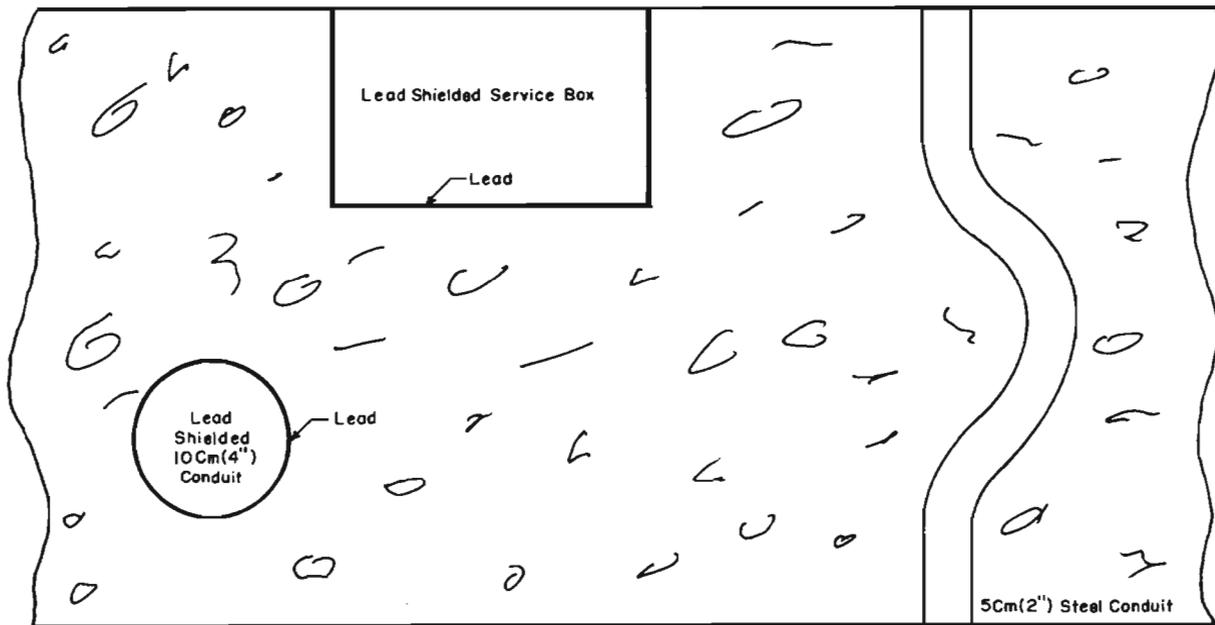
Lead shielding of service box and conduit in concrete barrier. On the right are shown bends required for a conduit passing through the barrier.
